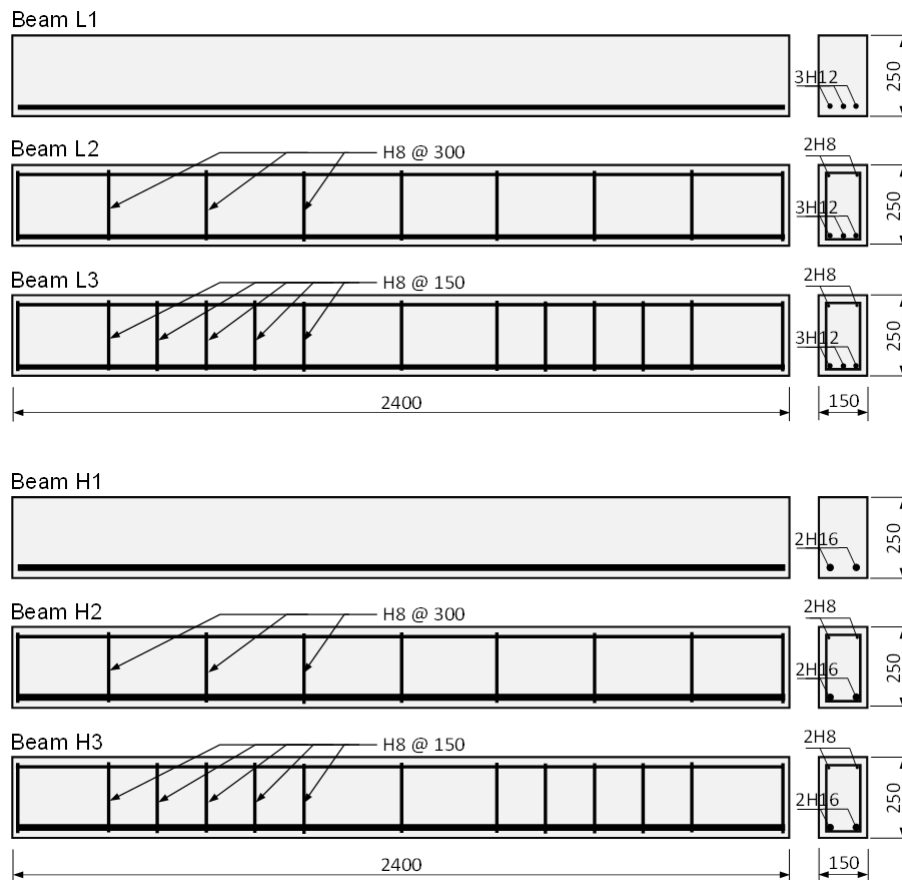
Beam geometry and bar configuration (dimension in mm). In each beam, 30 mm clear cover was provided to the main bars.
